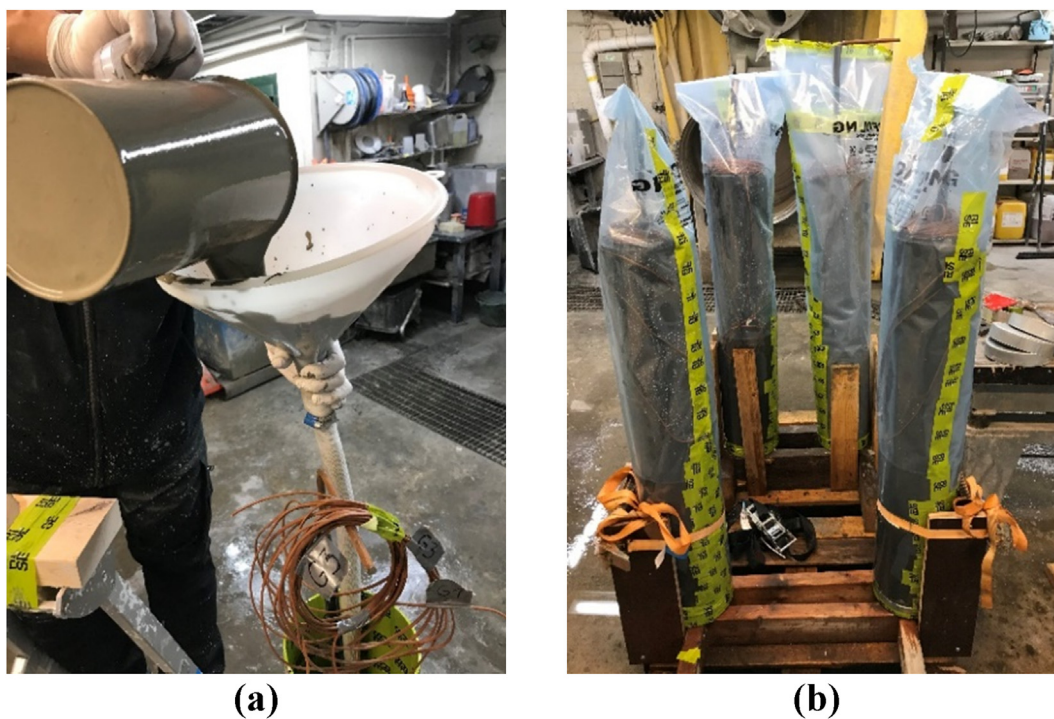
Casting and curing of the grout columns: (a) Filling the grout through the funnel, and (b) Curing the grout columns.
